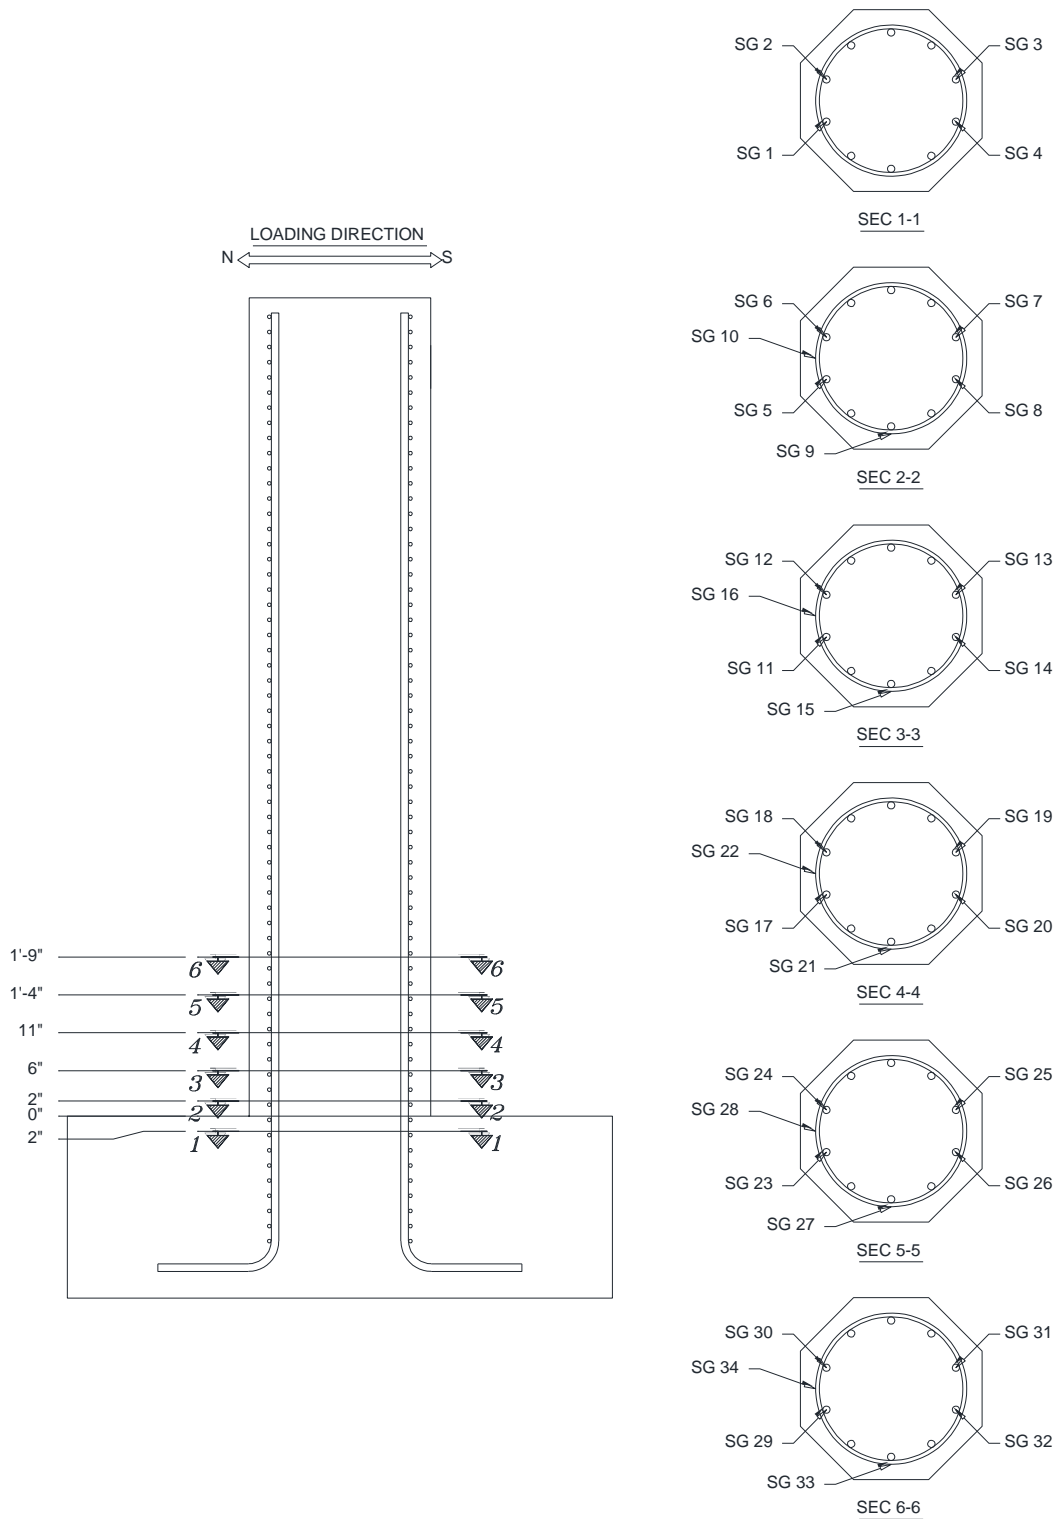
Strain Gauge Plan Used in Cast-in-place Column
